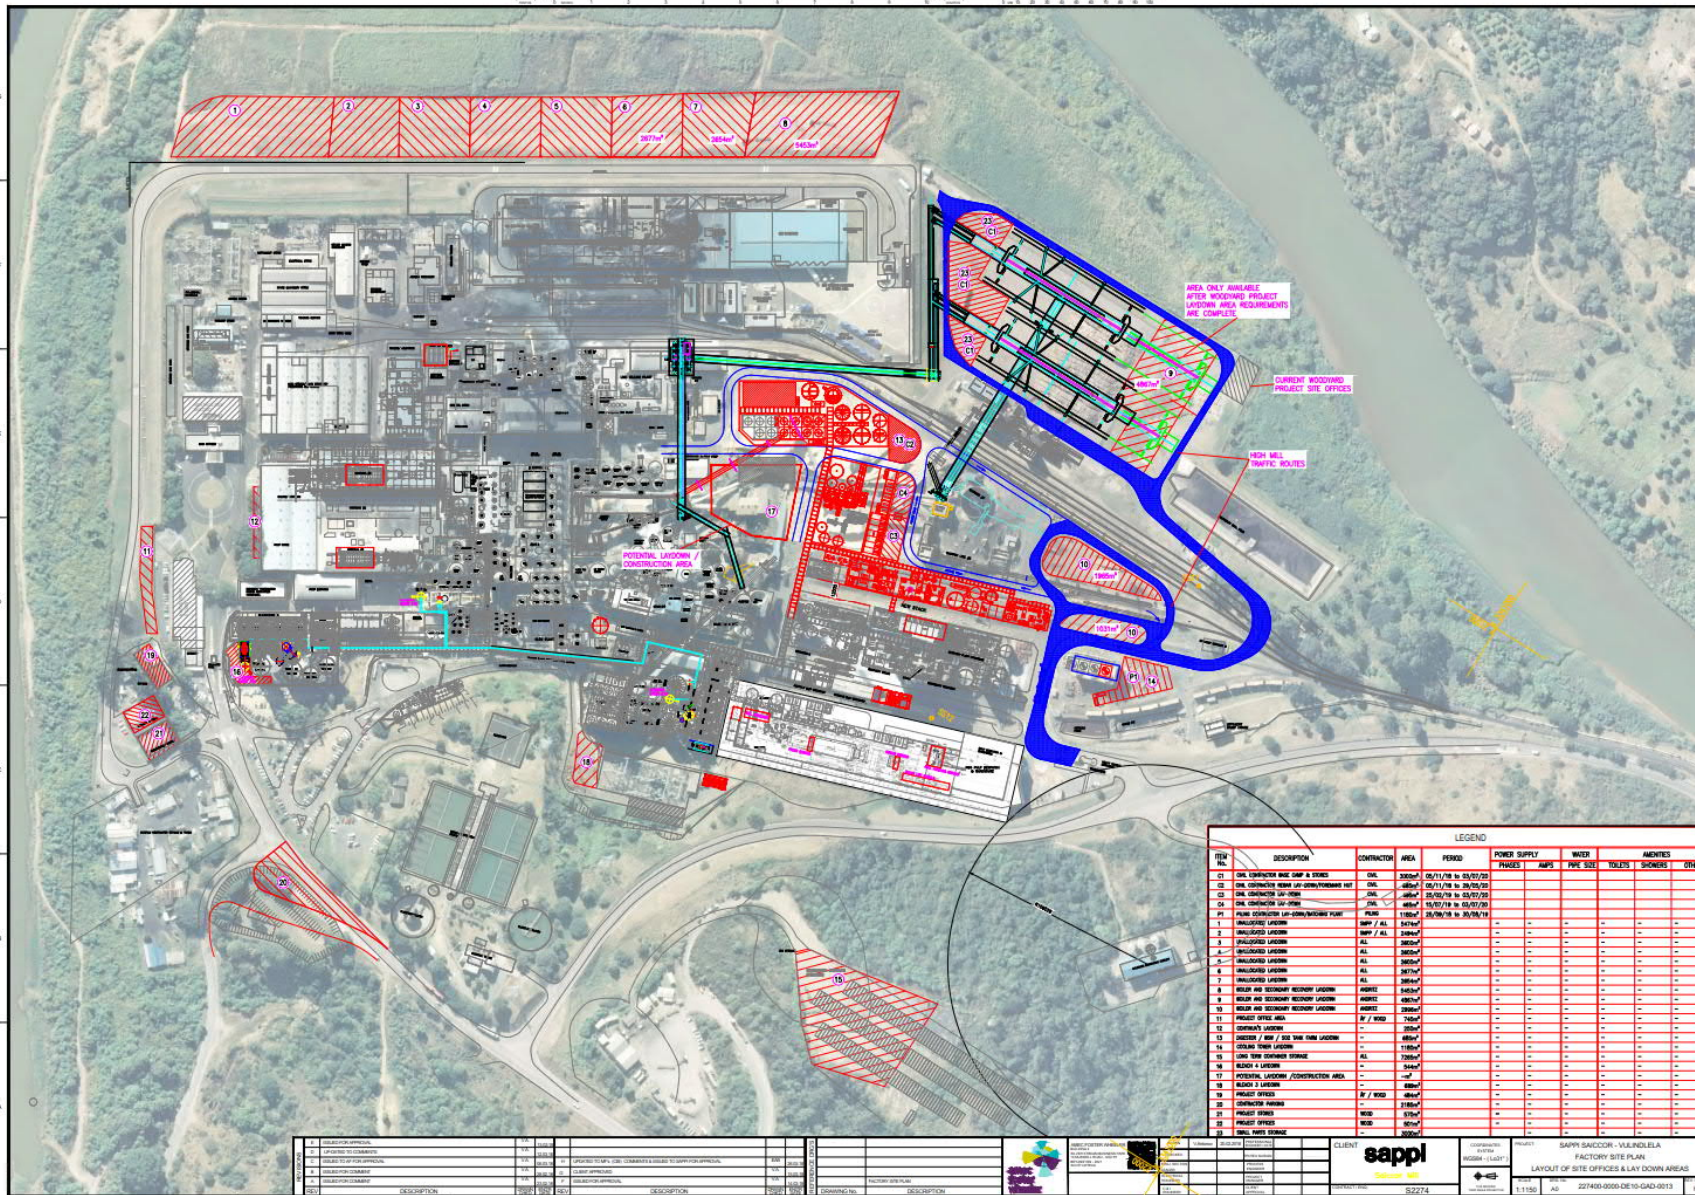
Proposed Construction Laydown Areas (indicated with red hatching)
